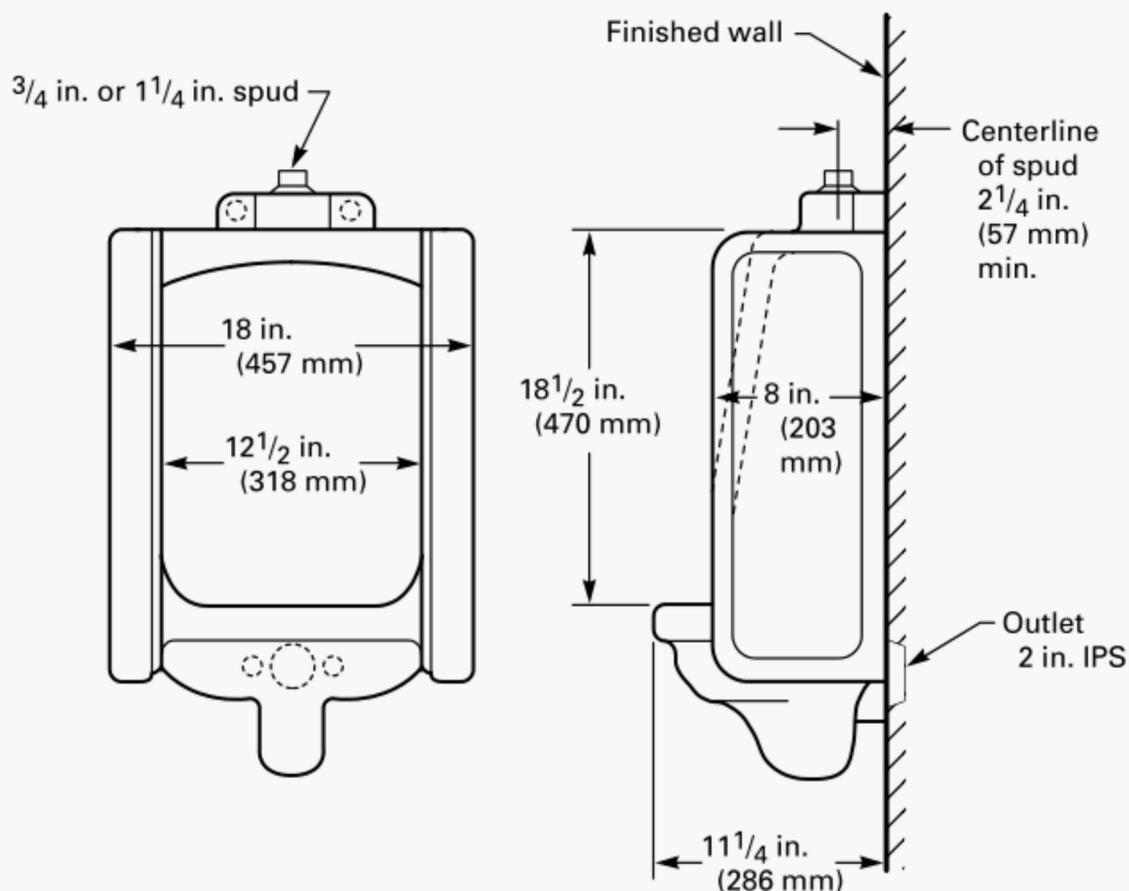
Wall-Mounted Washout Urinal With Extended Shields
